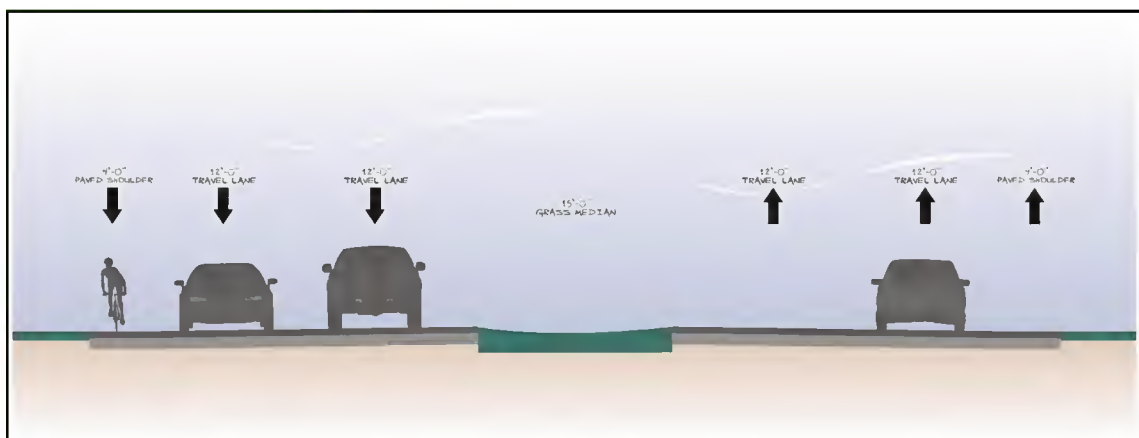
Rural Arterial Conceptual Cross Section
